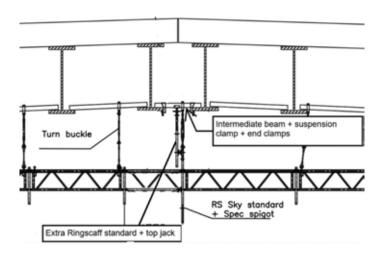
Section view of a suspended scaffold for a typical bridge section. The figure shows a solution against uplift with an additional RINGSCAFF standard plus top jack pushing against an intermediate beam.
